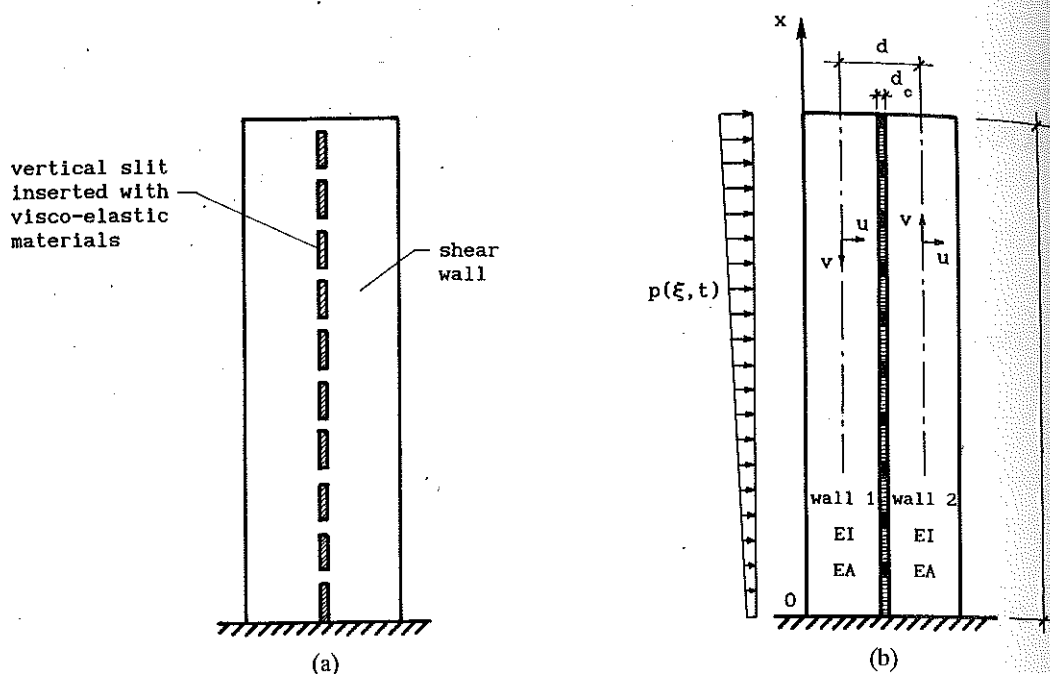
(a) A typical slit shear wall structure; (b) slit shear wall treated as two solid walls sandwiching a visco-elastic core
